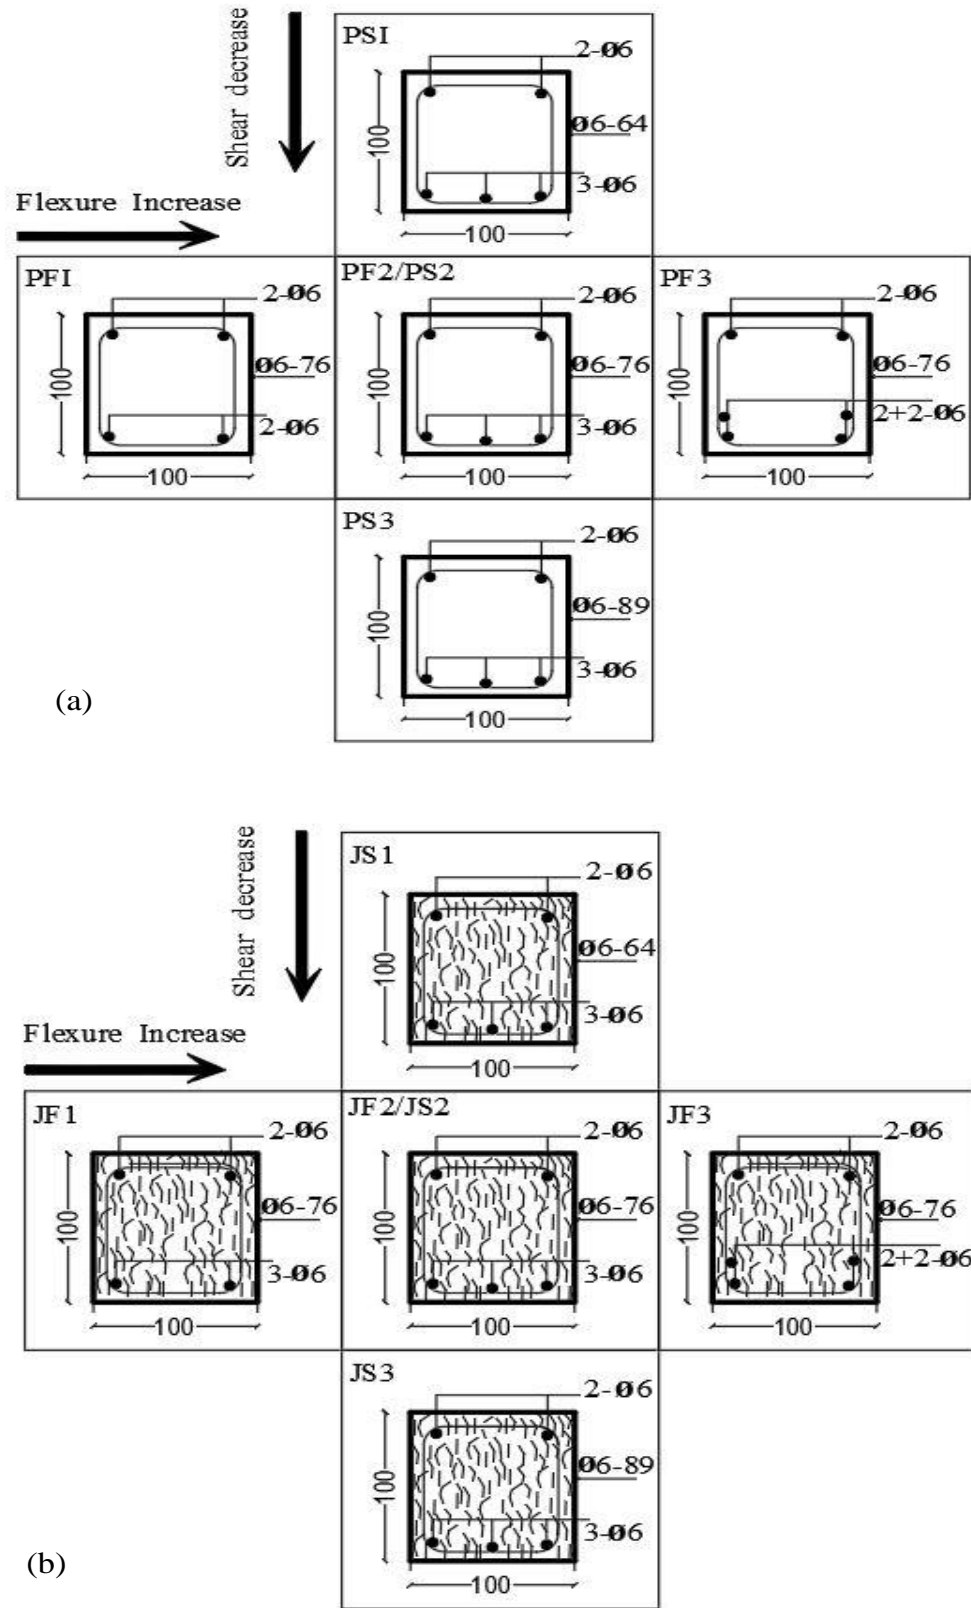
Structural details of beam-lets with GFRP rebars: (a) cross-sections of plan concrete, and (b) cross-sections of JFRC
